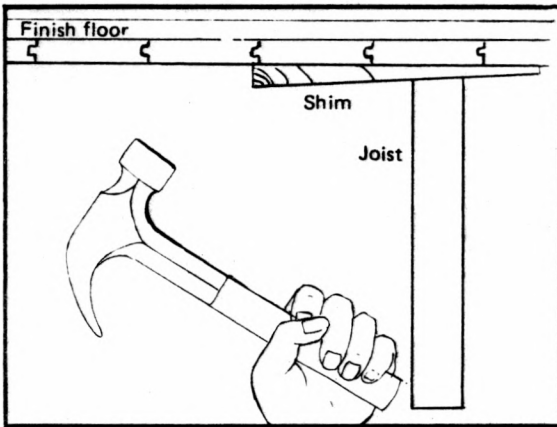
REPAIRING SQUEAKING FLOORING BY SHIMMING
